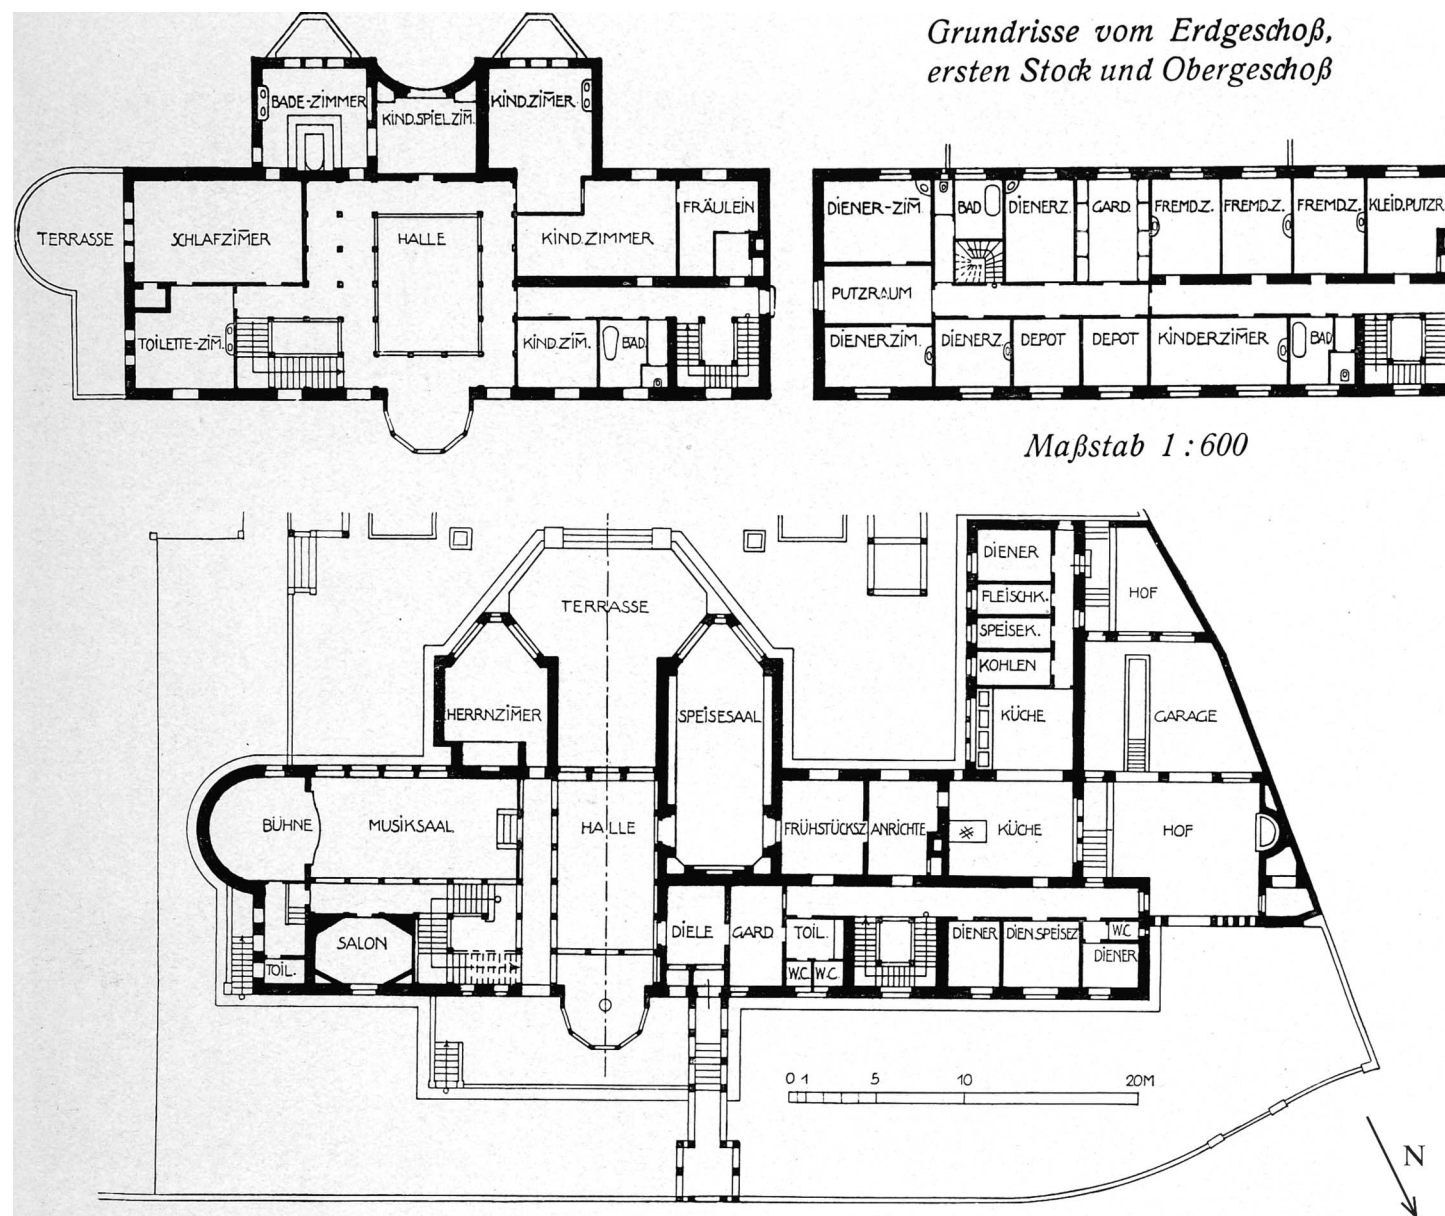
A. Floor plans of the house as published together with a site plan (see Figure 4B) in the architectural journal 'Moderne Bauformen' in 1914 (© MAK Wien, Moderne Bauformen XIII, 1914, p. 6).
